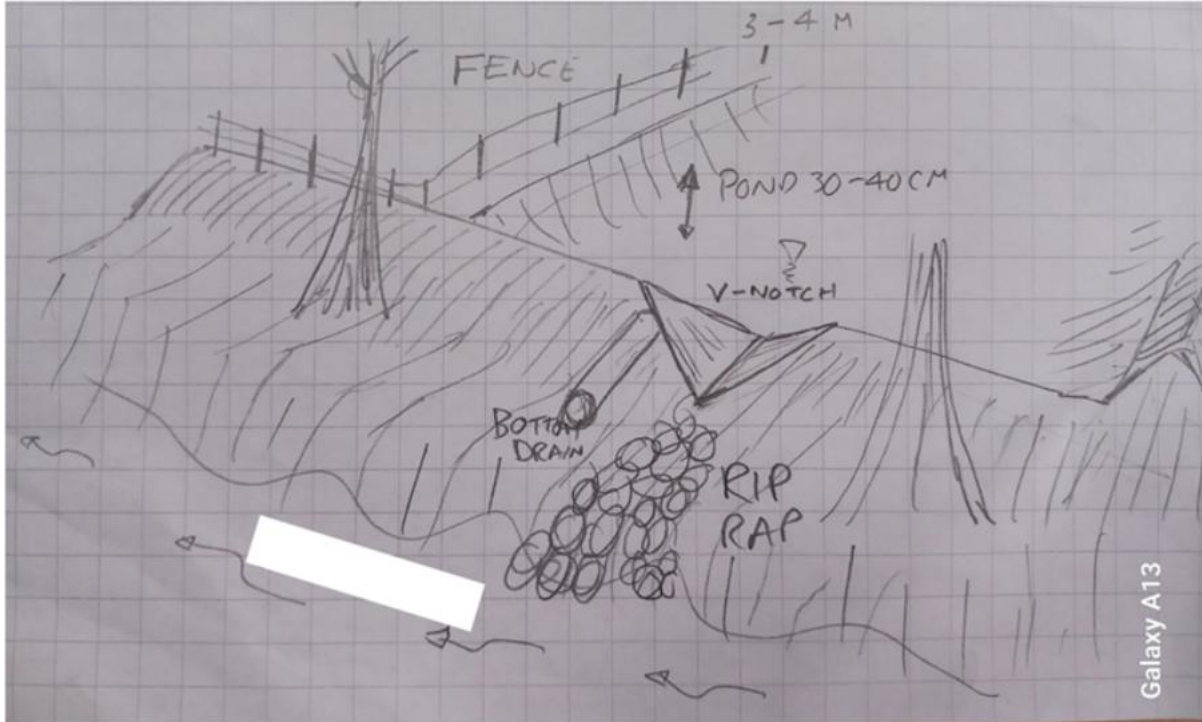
Conceptual design of Wetland and Temporary Storage Treatment Zone (outlet structure). Note the bottom drain will need to have a cap.
